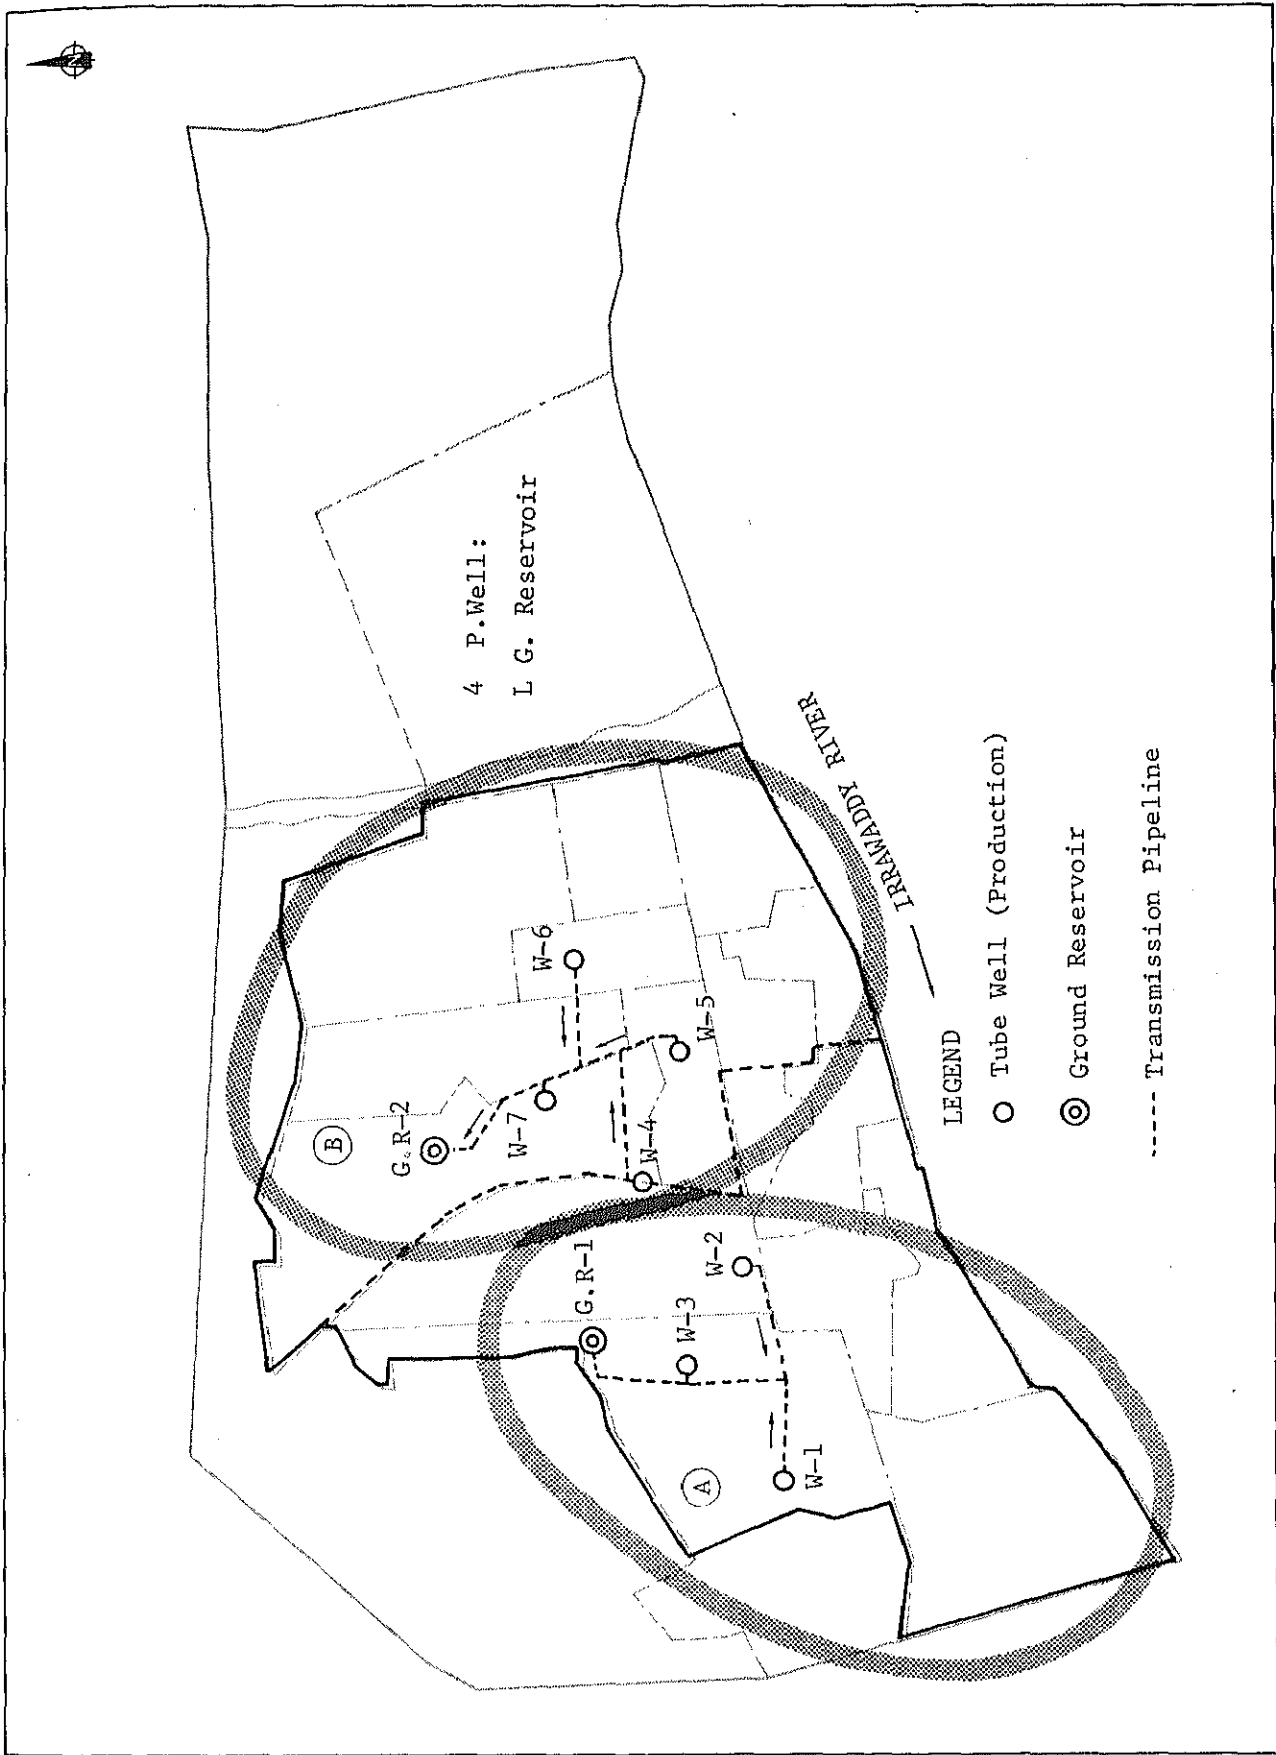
Layout Plan of Proposed Facilities
